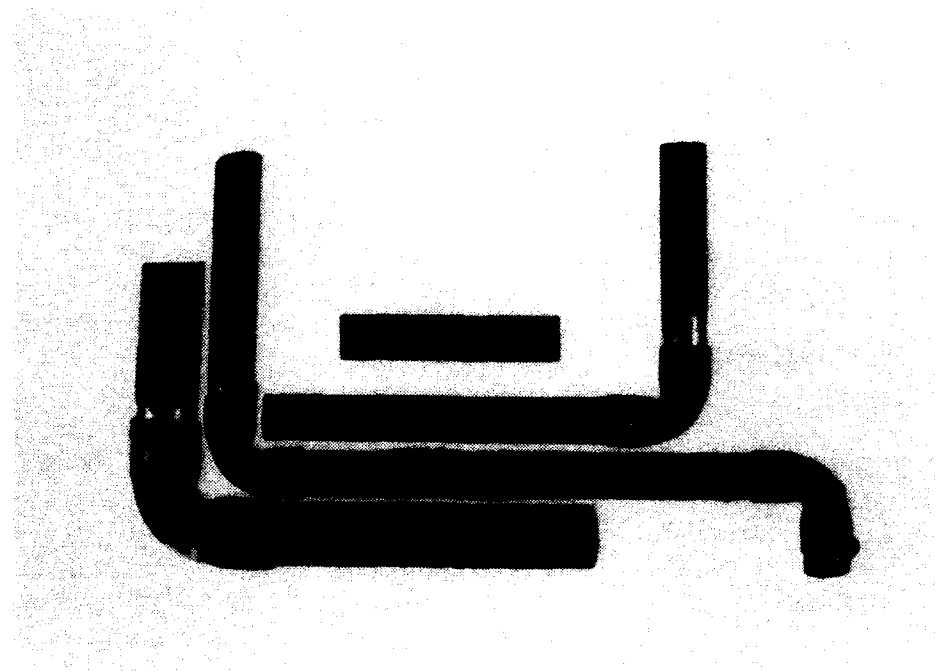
External Surface of Specimens 6, 7, and 8 Removed After Hot Water Flushing.
